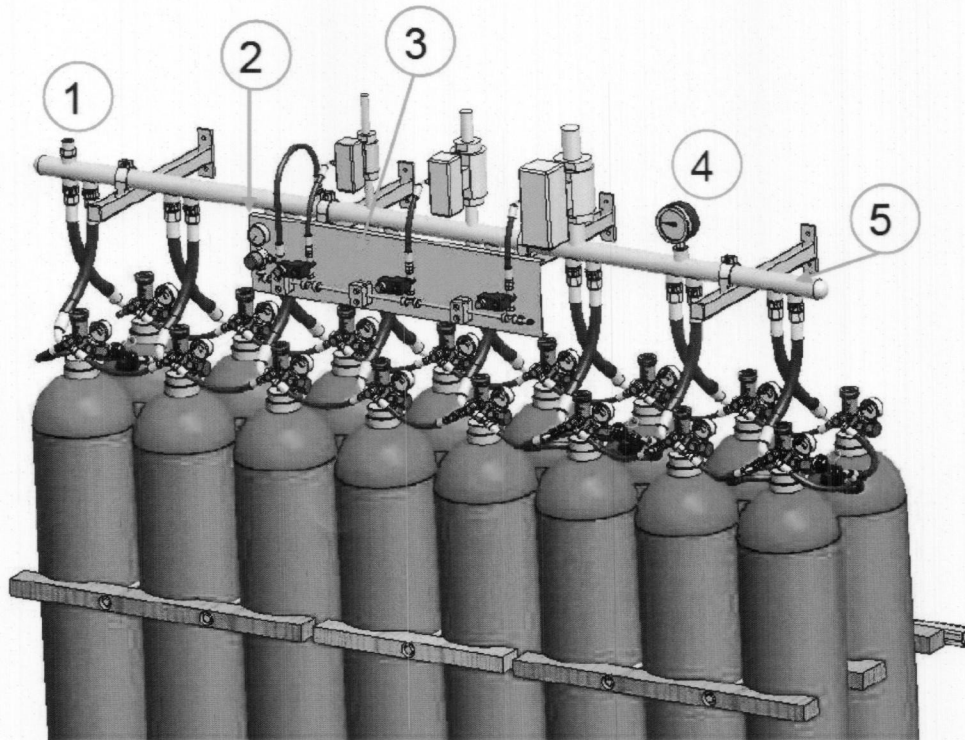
Multi-zone ARGONITE® C60 system, using a custom manifold with diverter valves and diverter valve pilot manifold. 1) manifold pressure relief device, 2) pressure regulator for diverter valve pilot manifold, 3) diverter valve pilot manifold, 4) manifold pressure gauge, 5) ARGONITE® C60 custom manifold.
